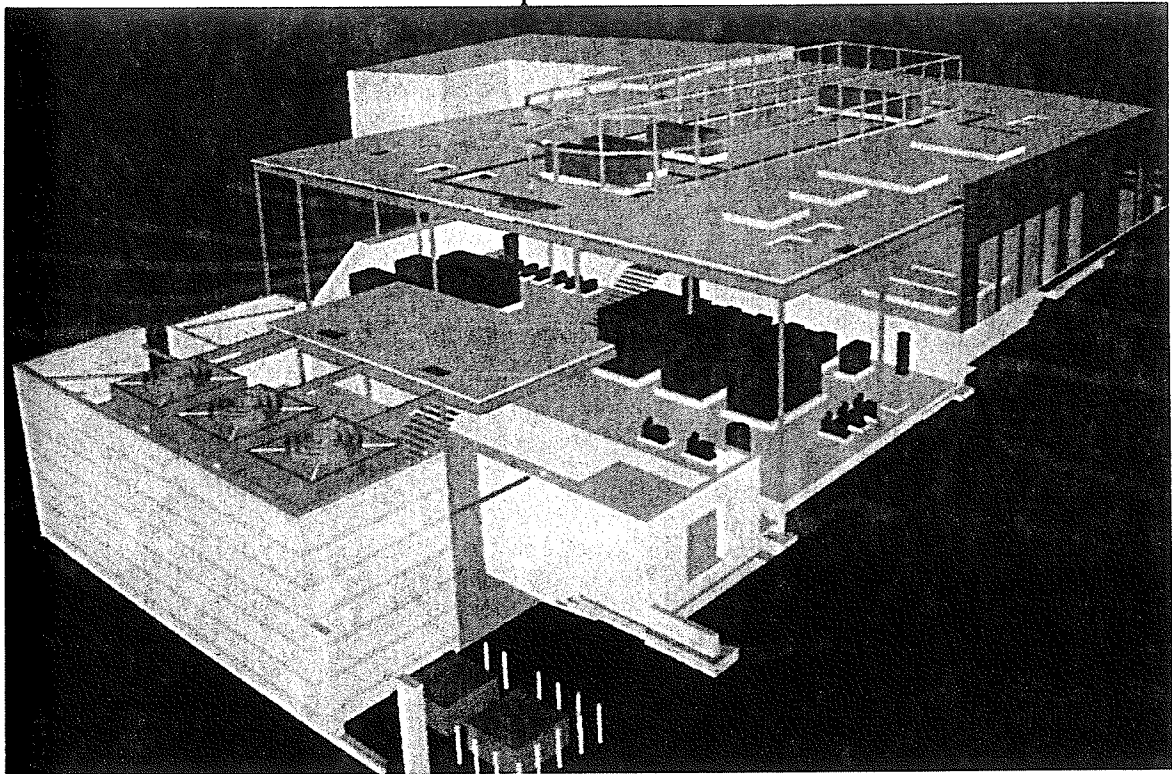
Feb 1995 All structural steel has been installed, concrete roof and all concrete equipment pads poured. Metal studs installed at the rear of the building to keep the front open to bring in equip.
